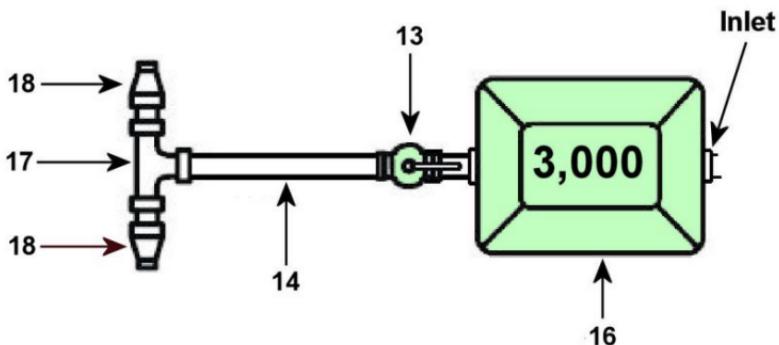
3,000-Gallon Tank Outlet Connections (Shower/Latrine).
